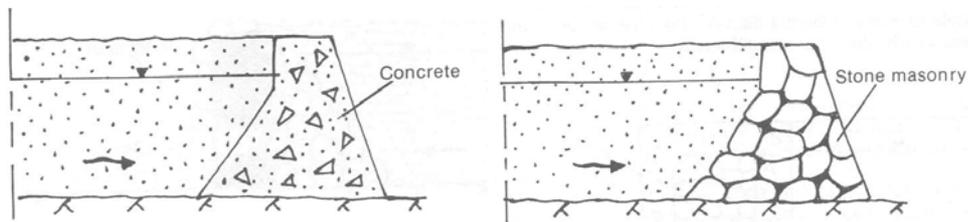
Concrete sand dam. Figure 2.11 Stone masonry sand dam
